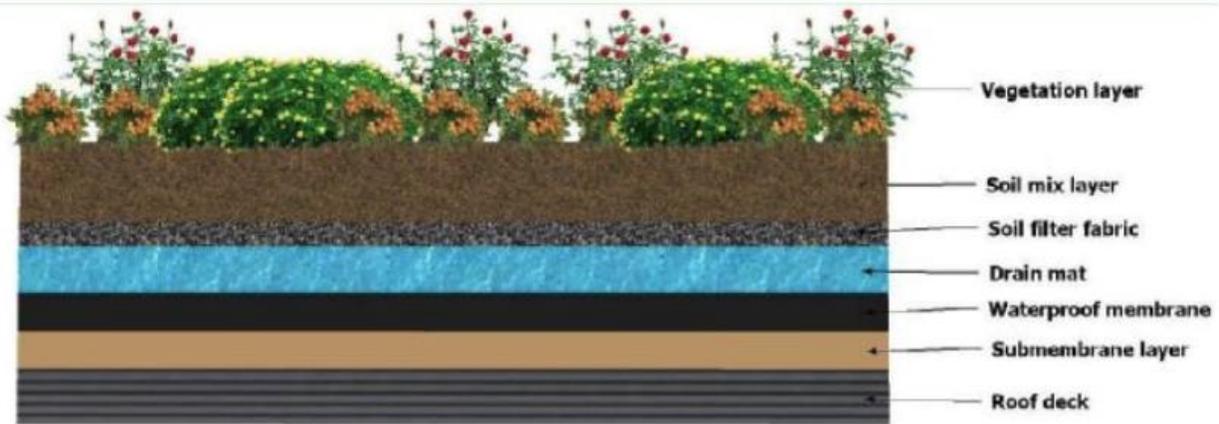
Typical cross-section of a green roof (Shishagar, 2013)
